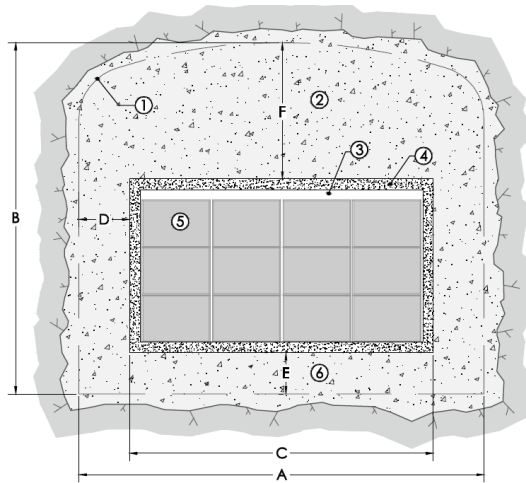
Cross-section of the disposal galleries in the SKB (Swedish) SFL concept in a rock chamber in crystalline rock 1) Gallery contour 2 and 3) grout 4) reinforced concrete, thickness: 0.5 m. Dimensions: A = 20 m, B = 17m.
